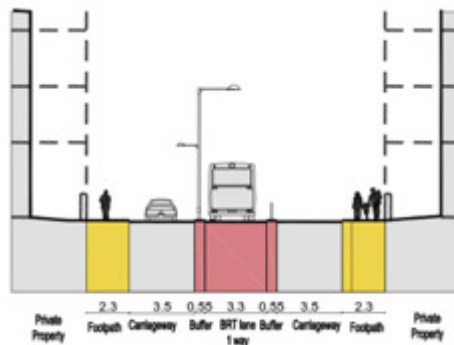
Ratu Road (Kutchery Chowk): 16 m BRT Cross section with two-way mixed traffic and one-way BRT lane.
